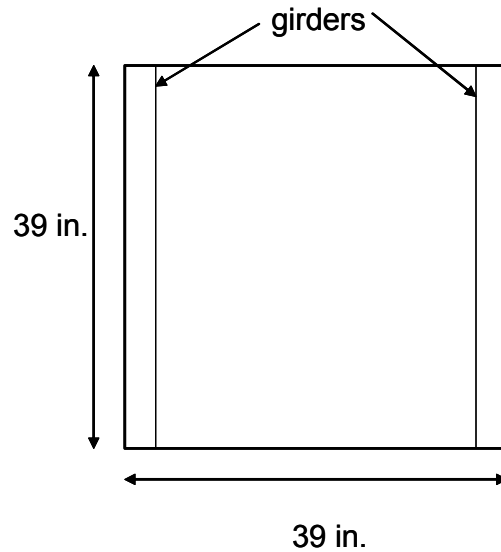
Plan view of test specimen (Azad et al. 1993)
